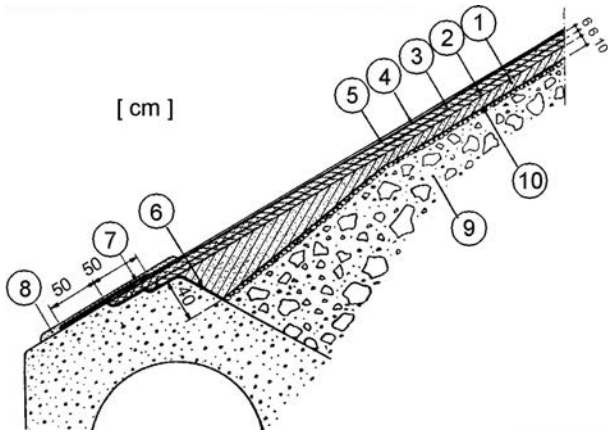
Joint of the facing and the concrete gallery at Sainte Cecile D'Andorge dam (after Thomas, 1976). (1) Drainage asphalt layer; (2,3) asphaltic concrete; (4) mastic; (5) light paint; (6) binding coat; (7) reinforcement; (8) shot-crete; (9) crushed rock 0–200 mm; (10) aggregate 15–45 mm.
